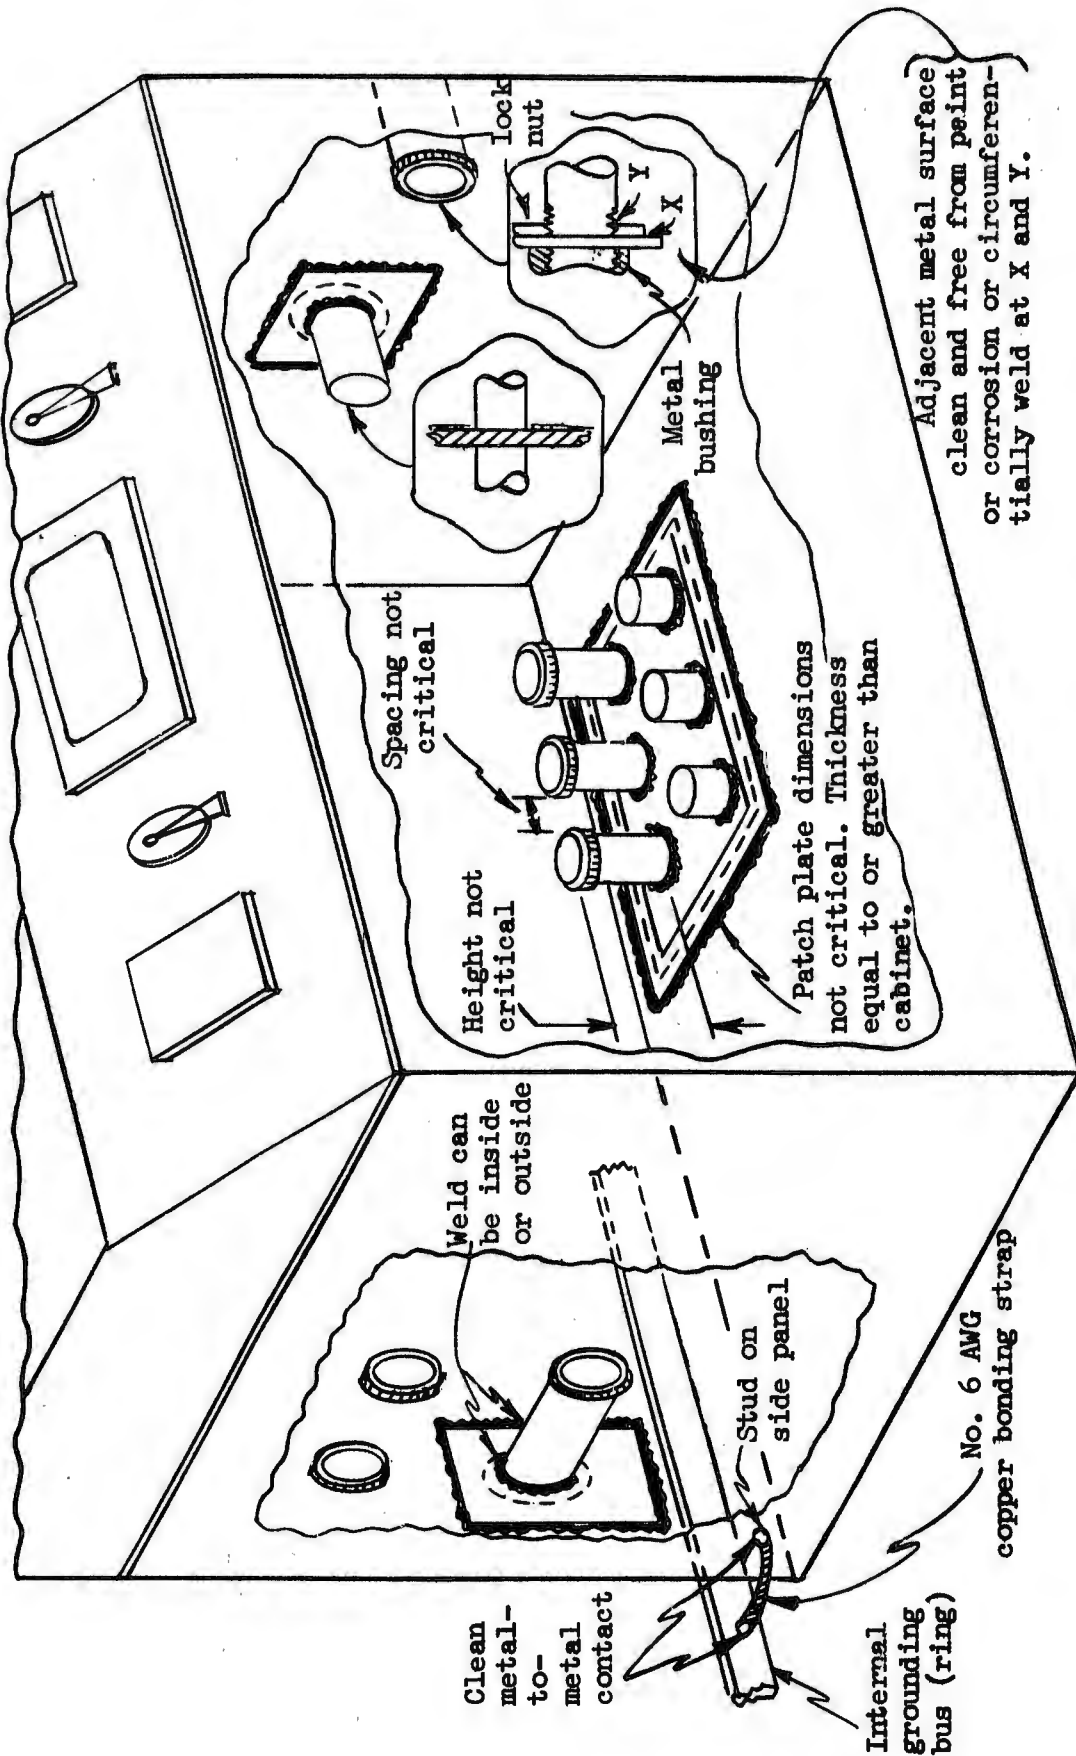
Conduit Terminations at Equipment Cabinets (Does not apply to shielded control room.)
